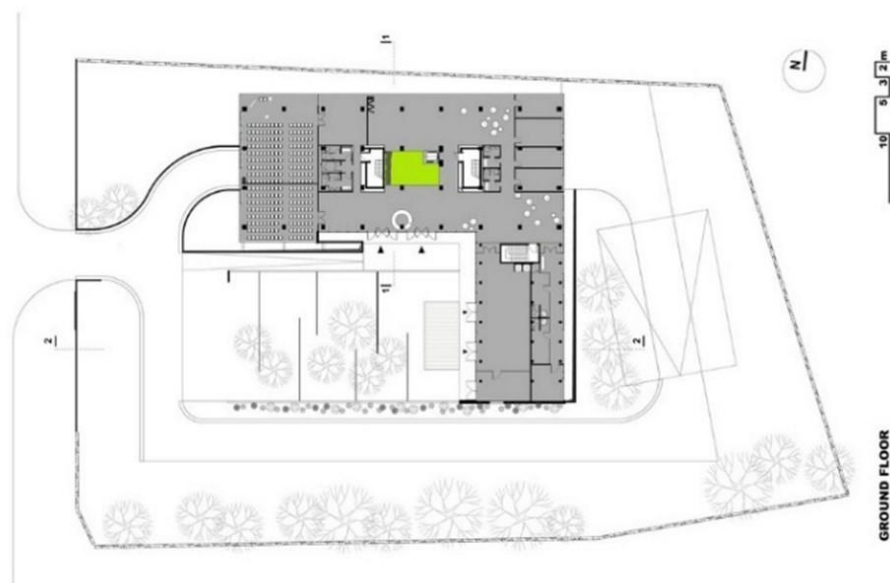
INCUBOXX GROUND FLOOR PLAN (Gaivoronschi, 2014)
